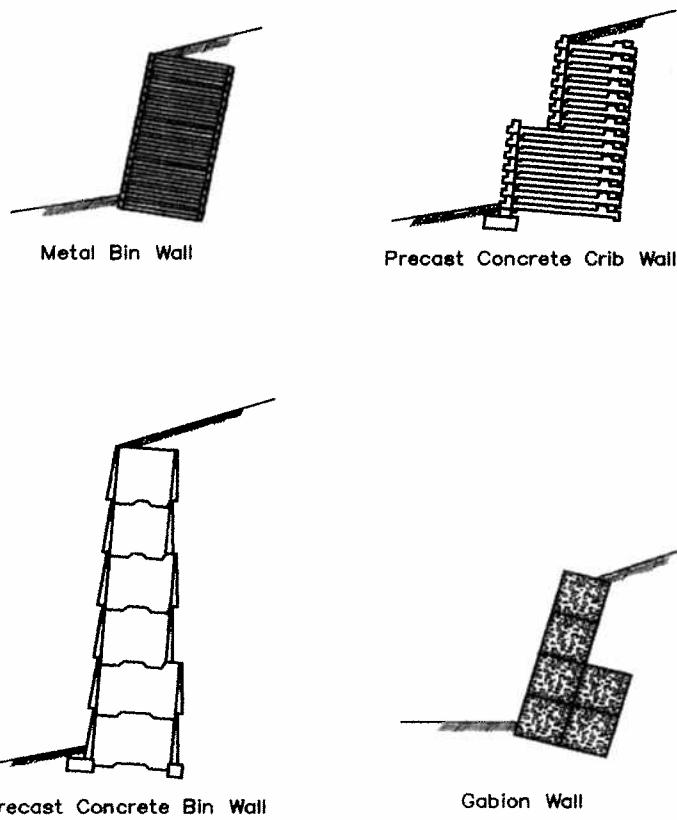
Typical Prefabricated Modular Gravity Walls.
